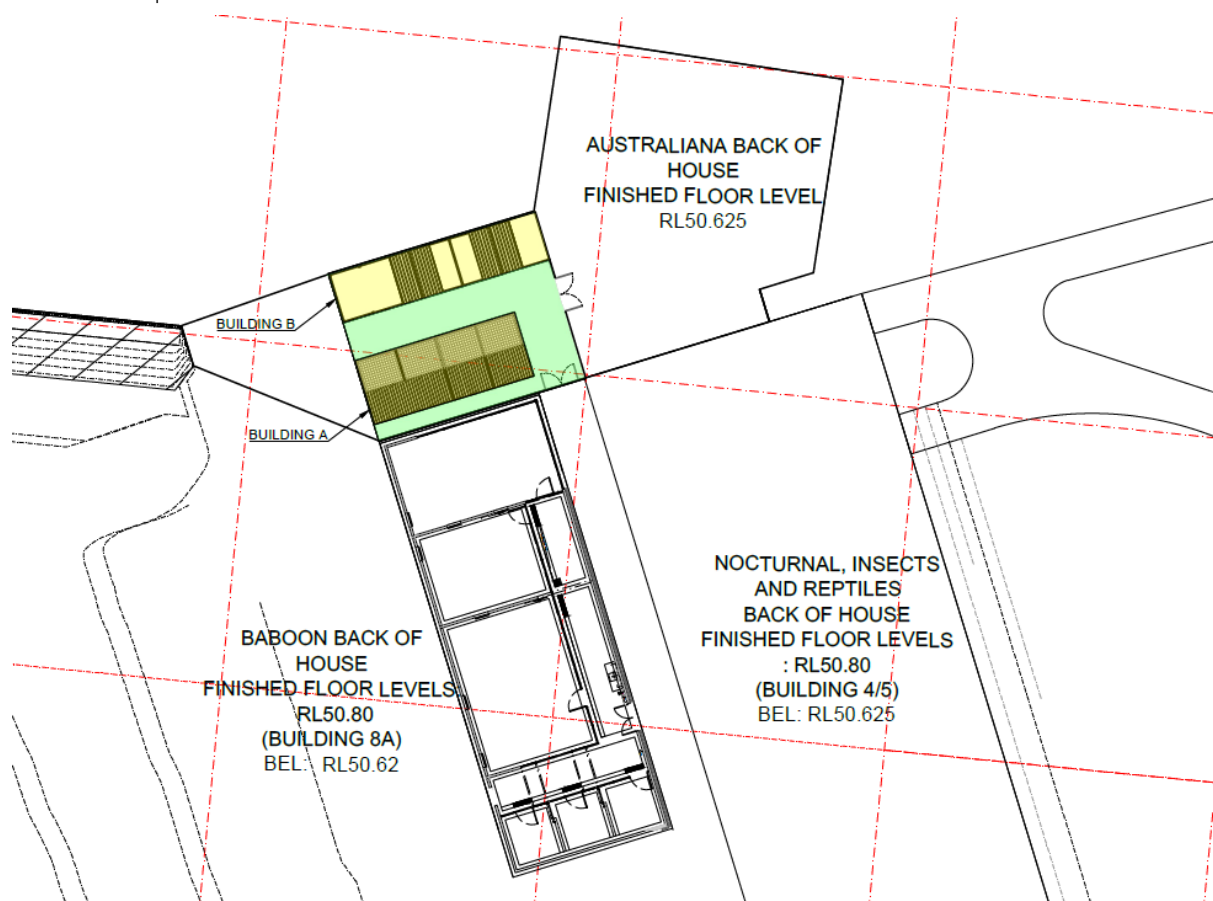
| Proposed Back-of-House Sheds – Site Plan
